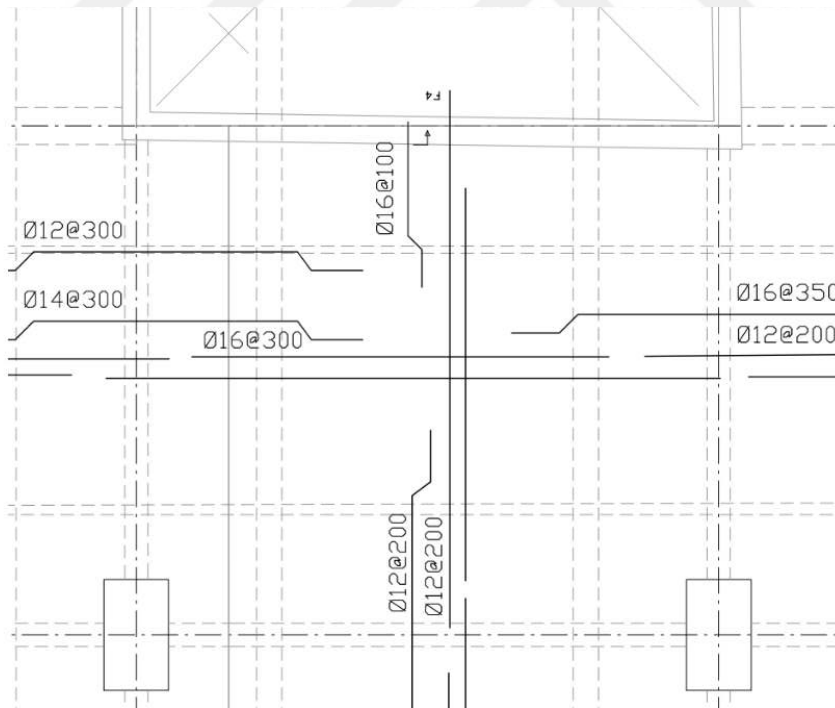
Middle Strip Steel Reinforcement for Panel (8.3x7.5) of Flat Floor (8.3-7.5-7.2).
